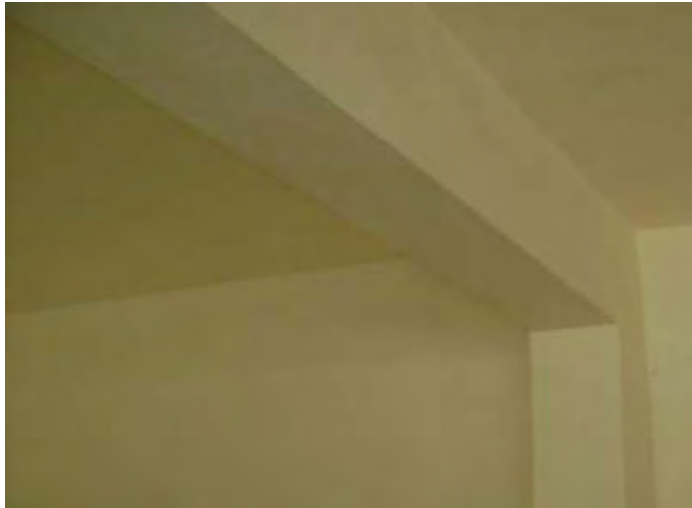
Reinforced concrete beam in Om Katheer school-Jordan.
